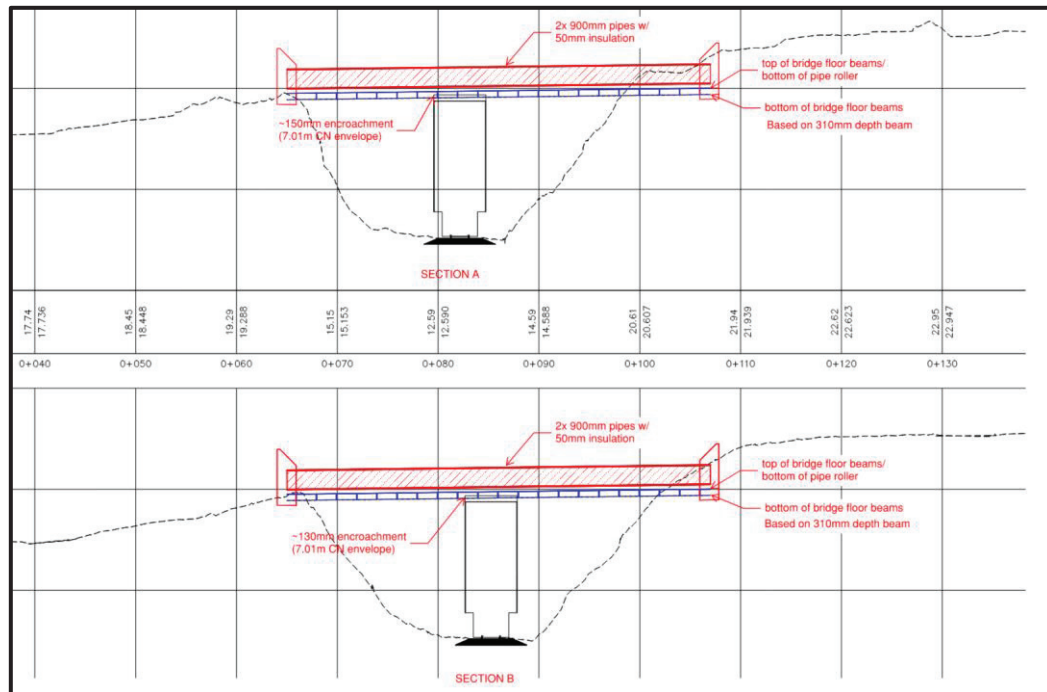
Utility Bridge Profile View on North Side of Jubilee Road
